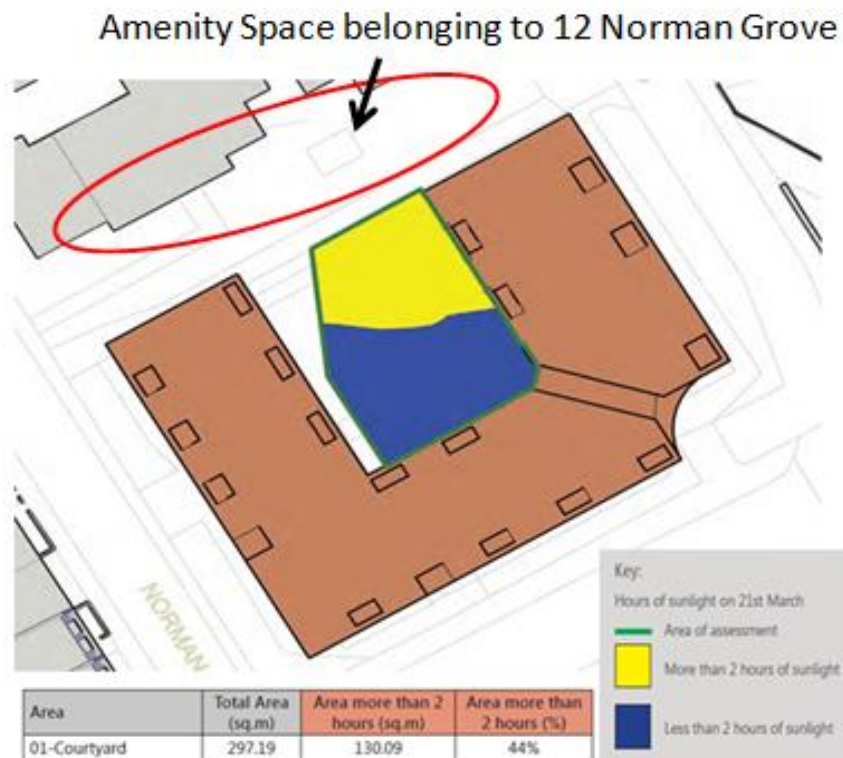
Plan showing location of amenity space at 12 Norman Grove.
